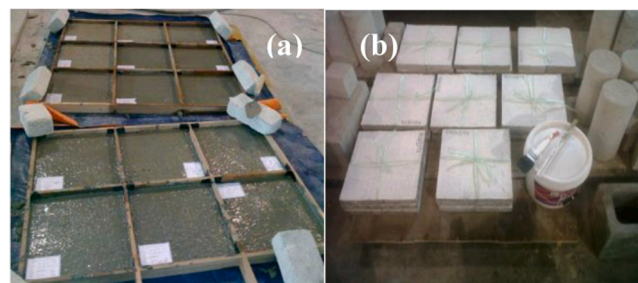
Slab specimen preparation (a) Slab formwork (b) Slab specimen with whitewash applied.
